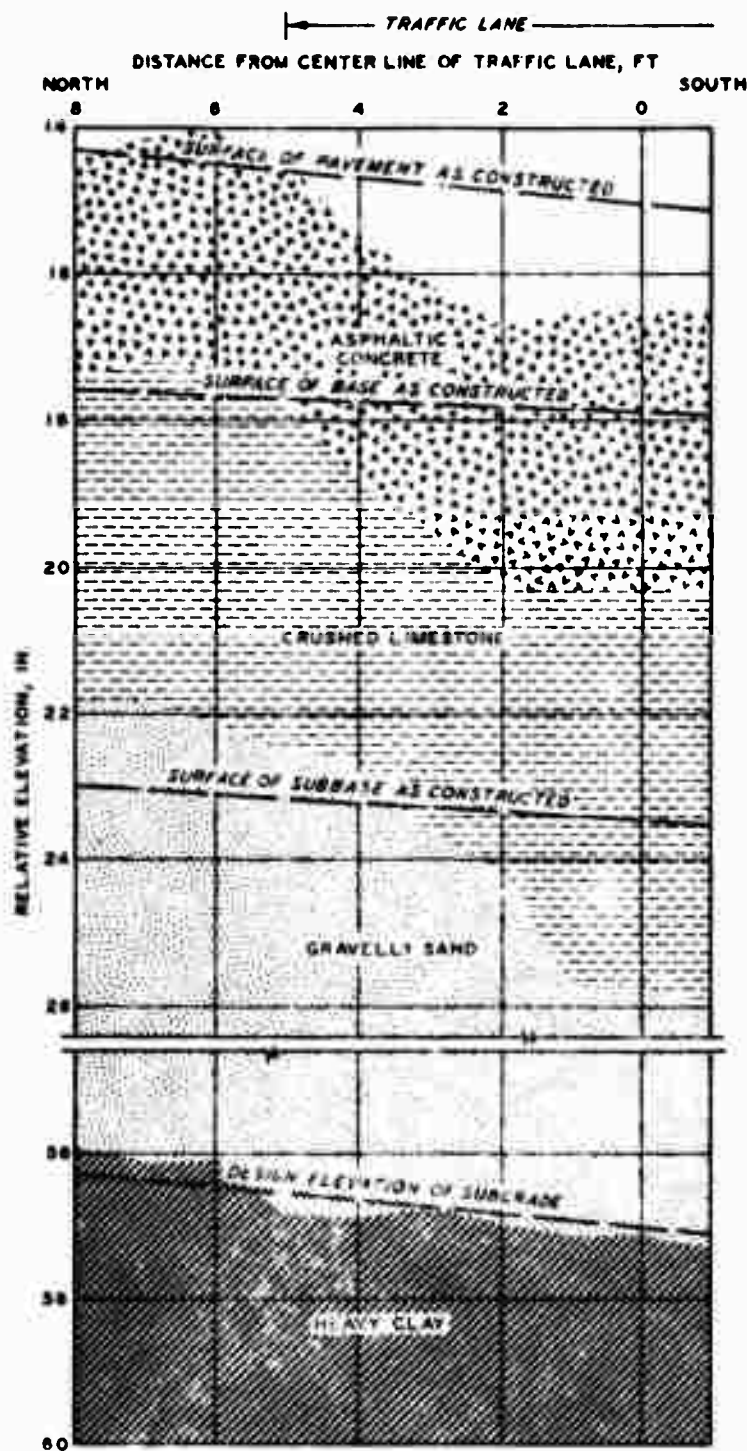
Test pit profile of item 5, lane 2, flexible pavement test section. Station 1+88 after 340 coverages of 240-kip twin-tandem assembly
